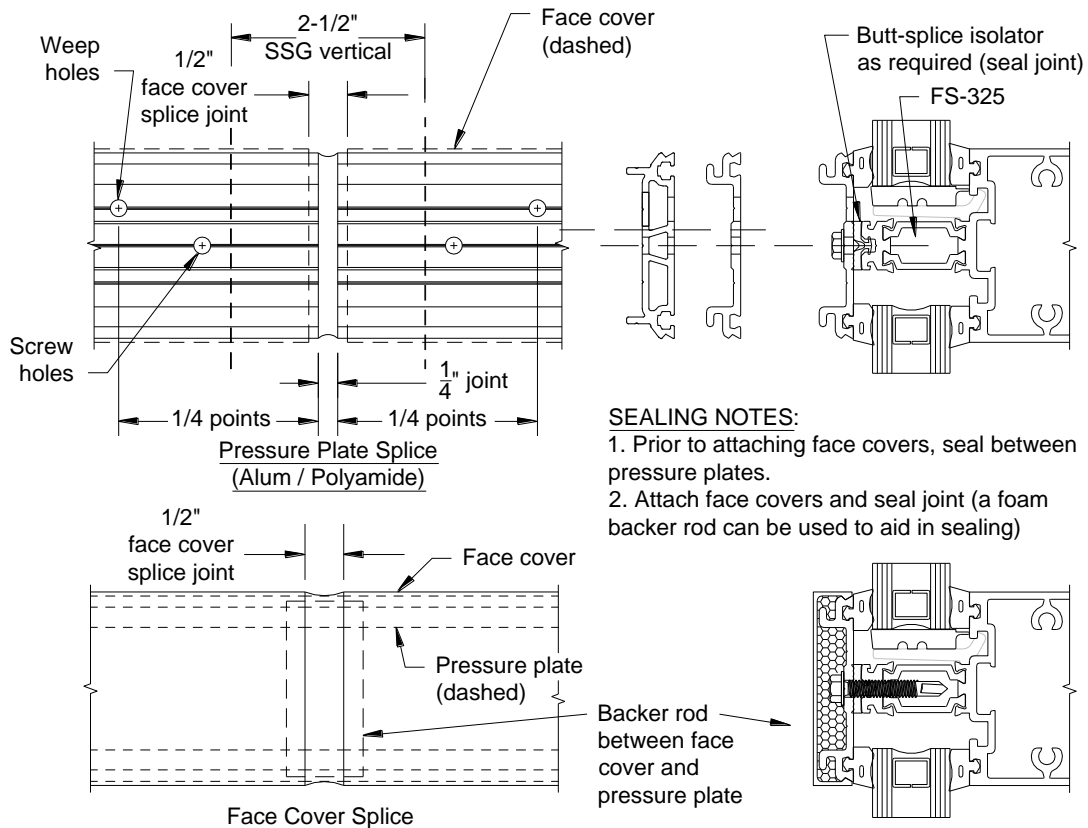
Pressure Plate/Face Cover Splicing & Sealing at SSG Mullions (Intermediate Horizontal Shown; Head & Sill Similar)
